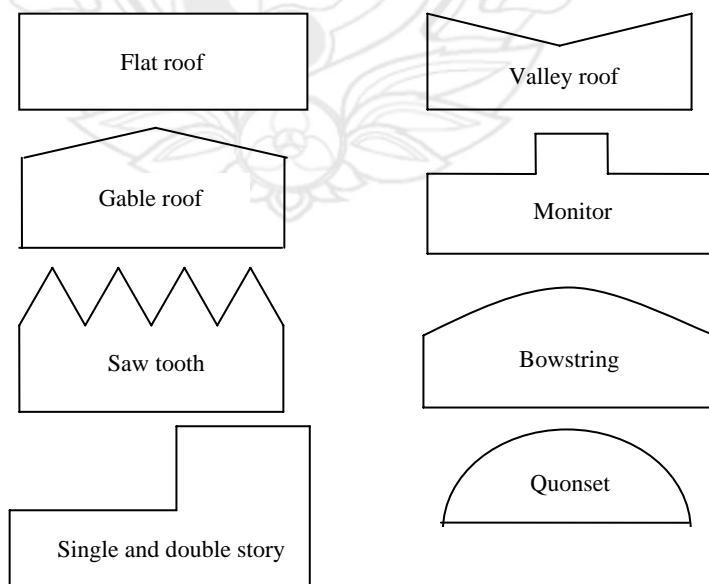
Typical building cross-sections.⁽¹²⁾
